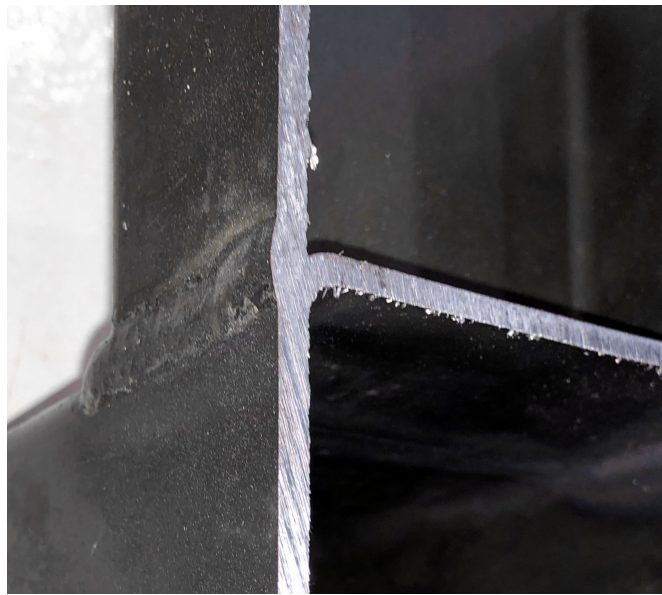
Cut through the welded connection in specimen C1B10M70, showing the partial butt weld used to connect two RHS profiles of equal width.
